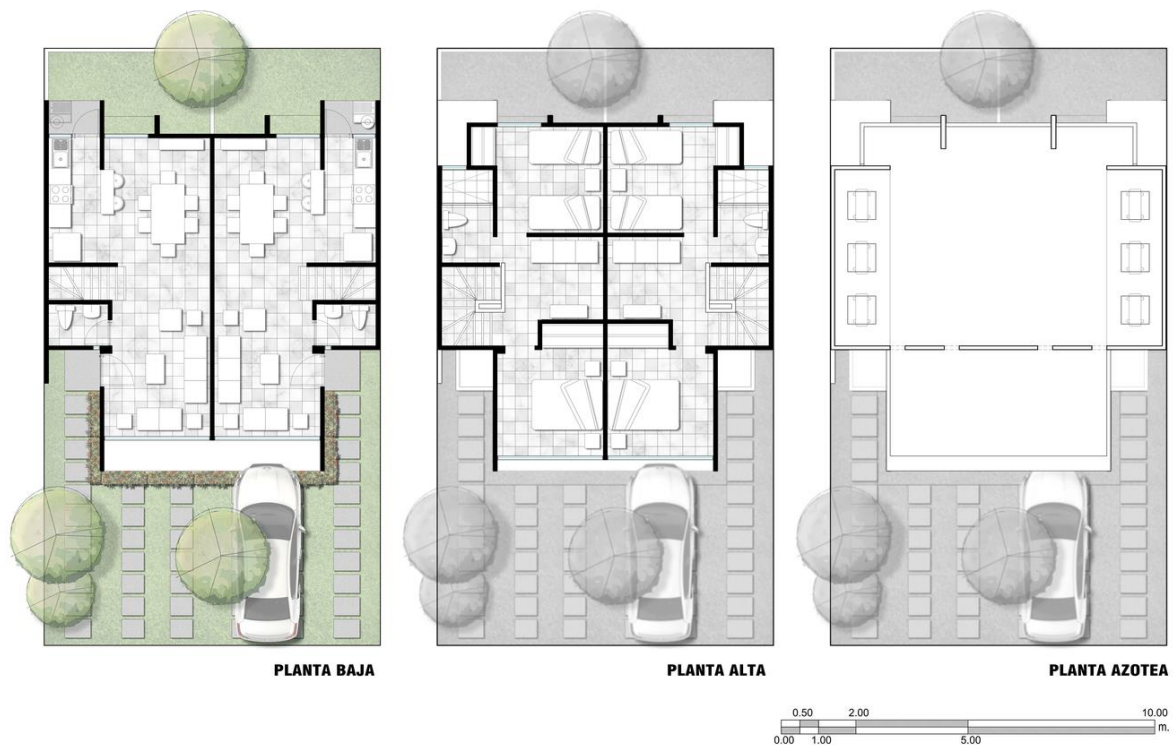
Duplex housing from left to right: first floor, second floor, and roof top plan. (Anon., 2017)
